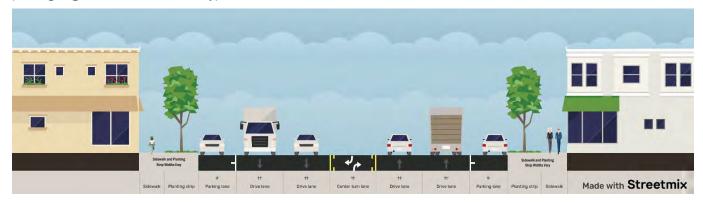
GRAND AVENUE FROM 8TH TO 13TH STREET
